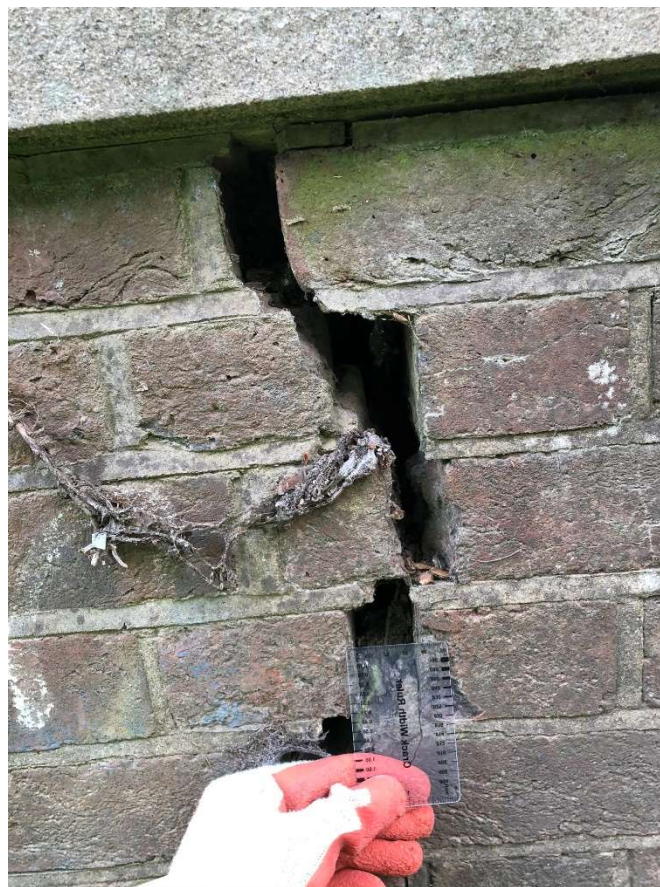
Approximately 35mm cracking on the eastern face of the parapet, north of the bridge
